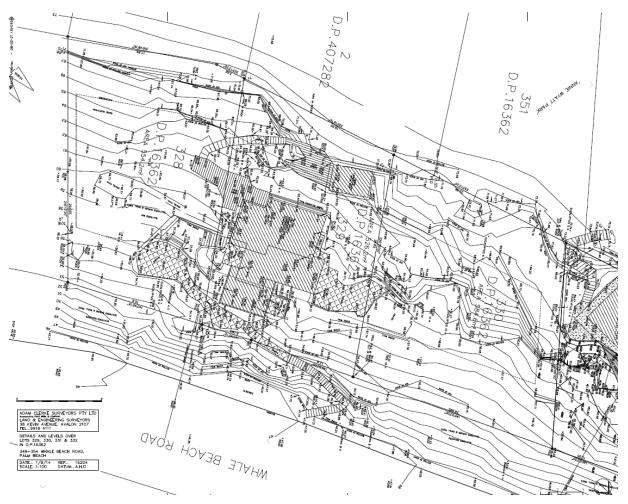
Extract of site survey showing the existing site improvements on Lot 328- 330 (Source: Adam Clerke Surveyors)
